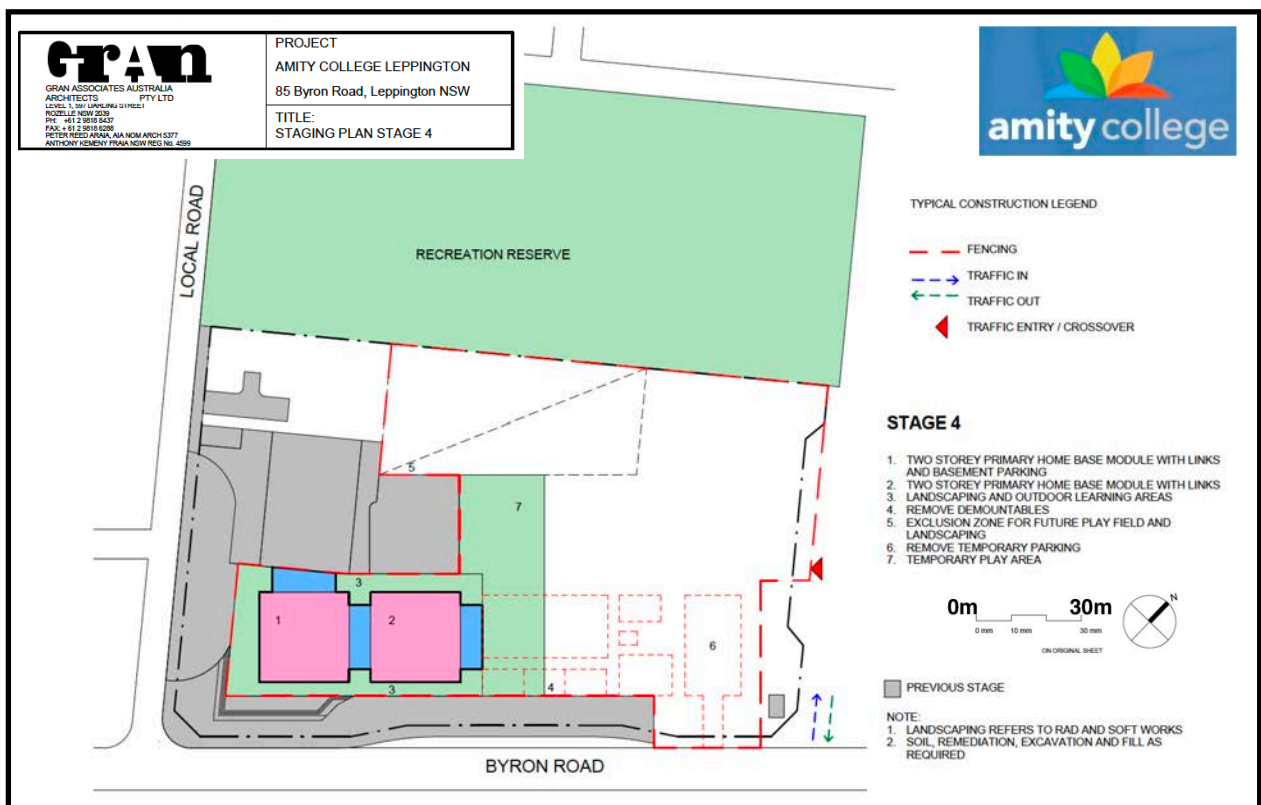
Proposed Stage 4 of Amity College school campus- Primary School additions, basement car parking and outdoor open space
